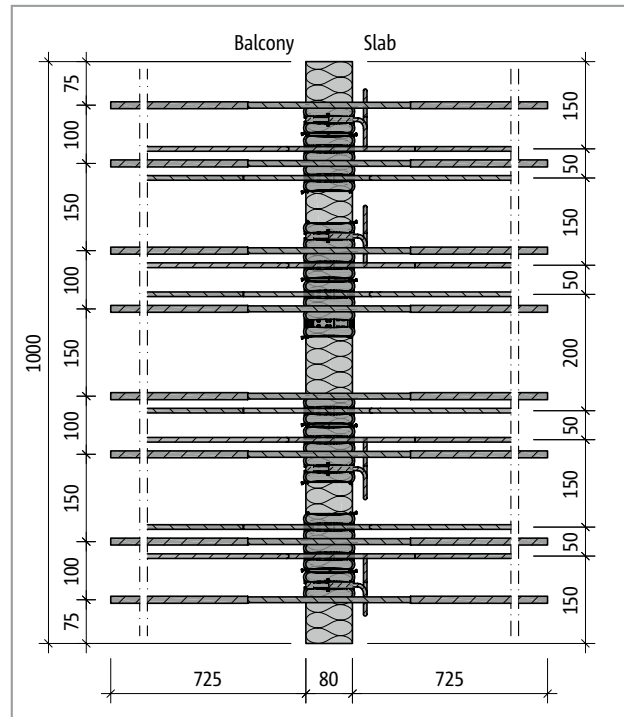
Schöck Isokorb® T type K-M6-VV1: Product layout
